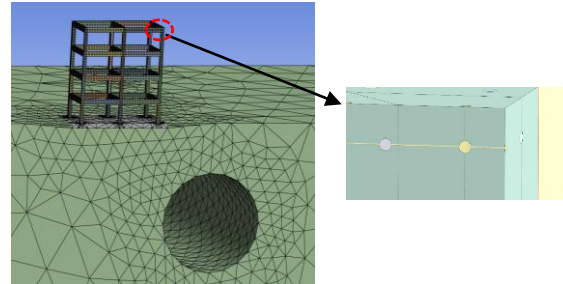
Reinforced concrete structure model with “reinforcement model type” option.
